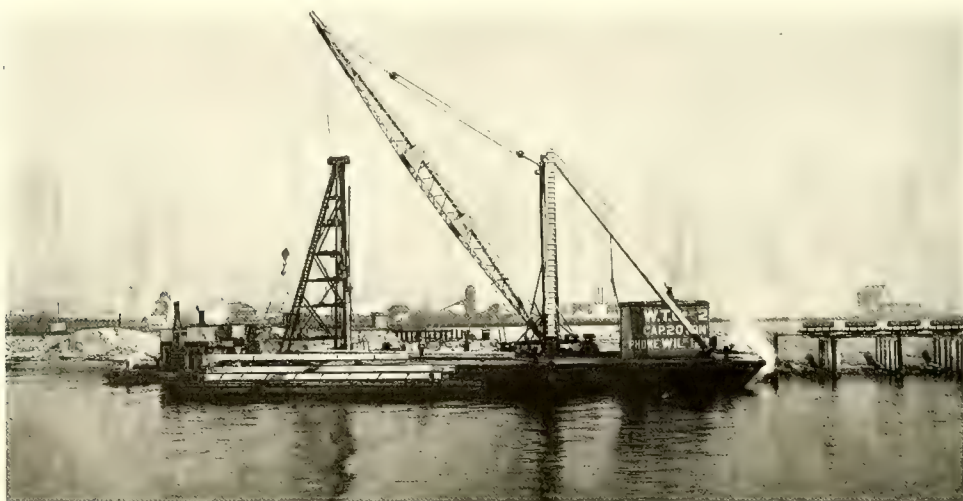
Handling and driving pre-cast concrete piles, Berth 230, Los Angeles harbor.
